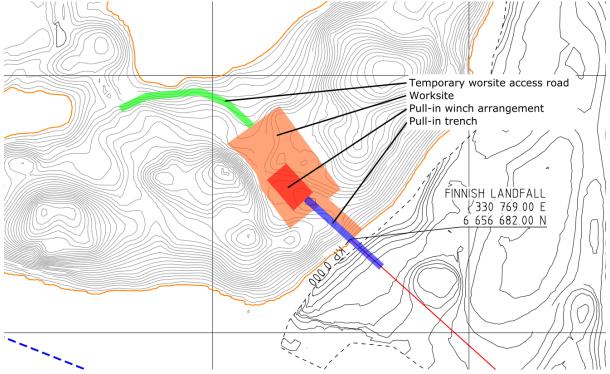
Sketch overview of the worksite at the Inkoo landfall
